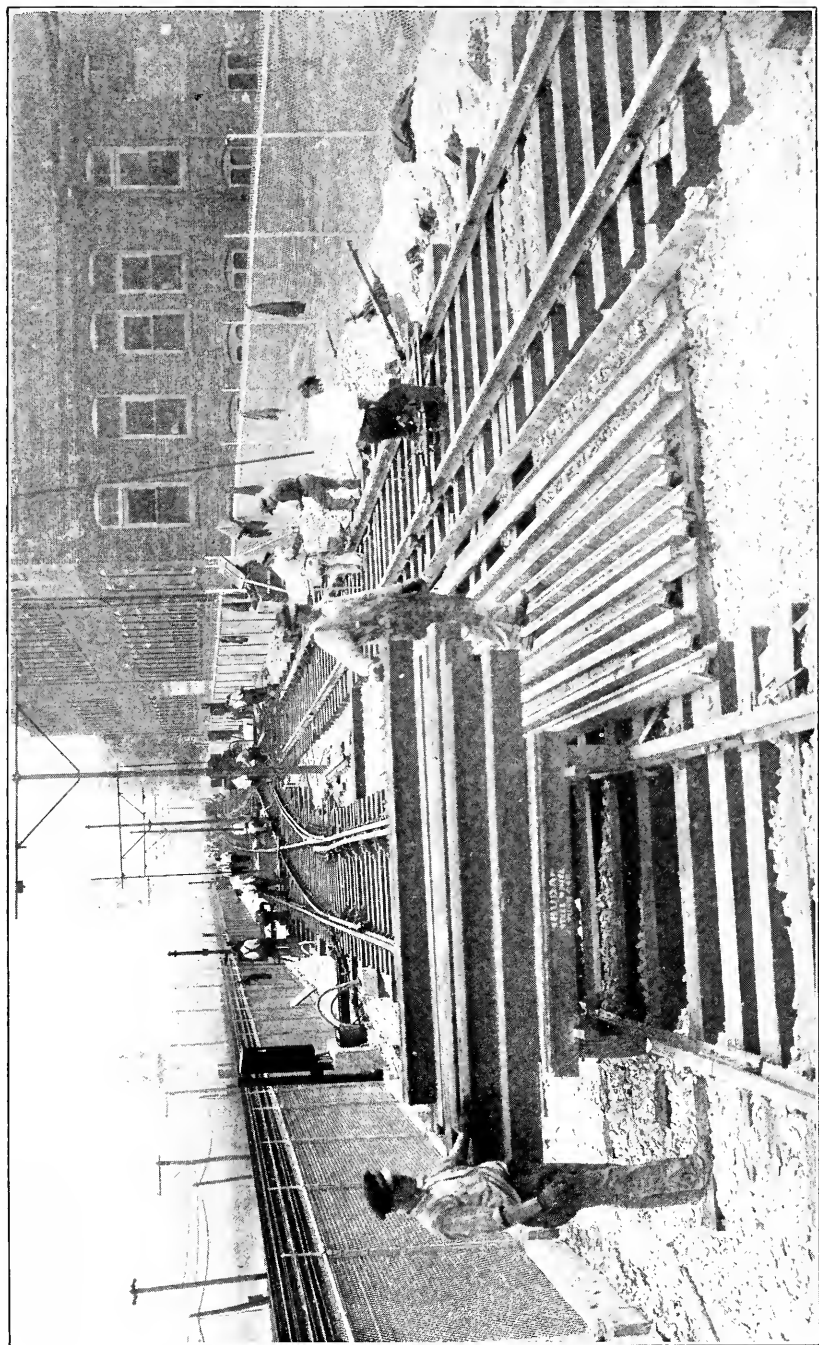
PLATE III.—GENERAL VIEW, OPEN RIGHT OF WAY, SHOWING WIRE FENCE ON EACH SIDE.
